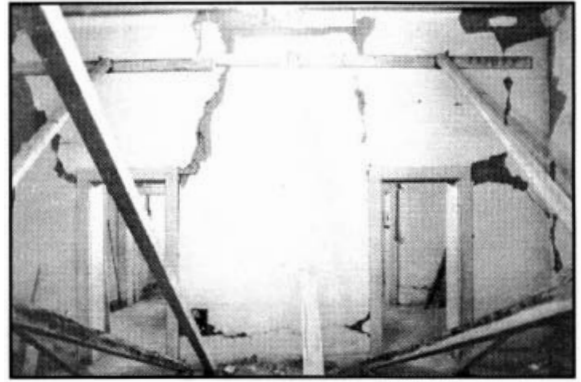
South side of the transverse wall between Rooms 9 and 10. Out-of-plane motion is the principal reason for damage to this wall.
